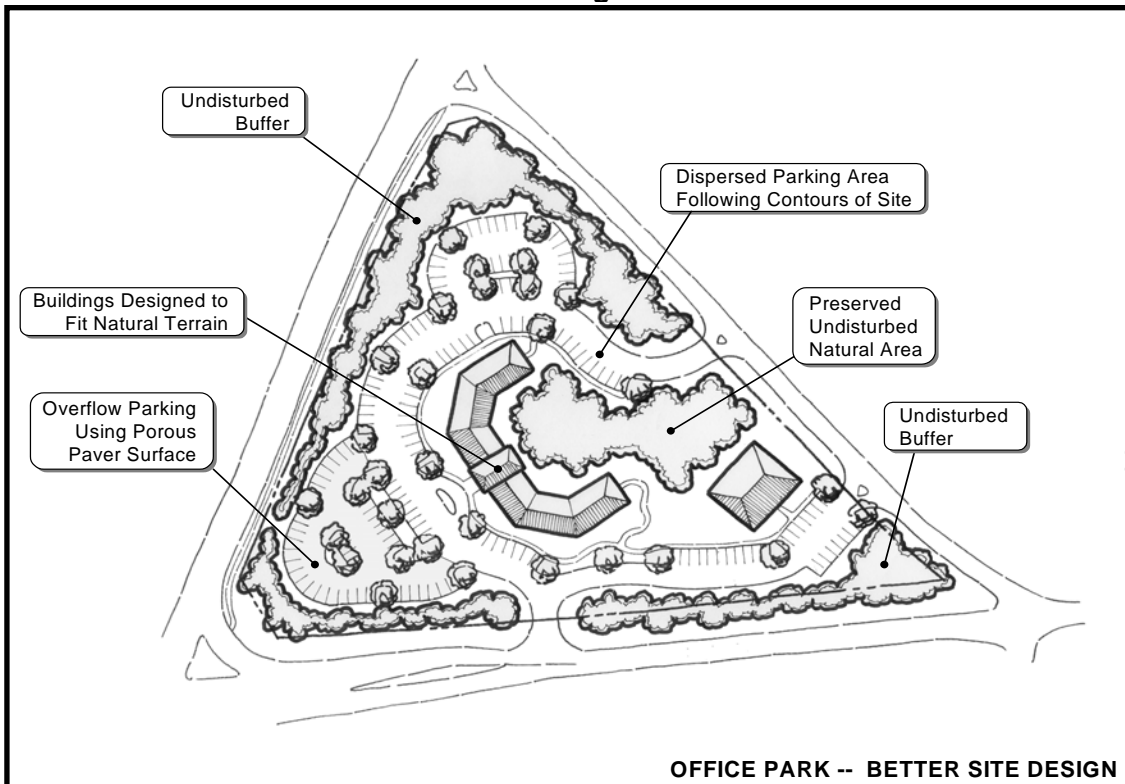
(b). Example 4 Office Park Development after Application of Better Site Design Practices
